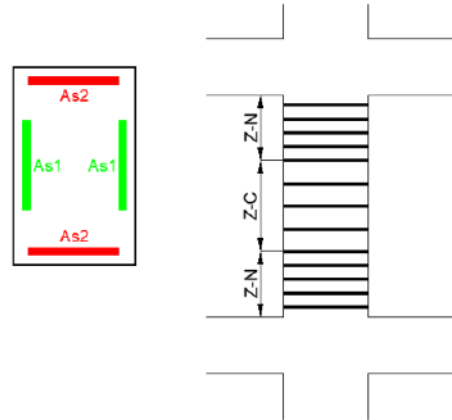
Column cross-section reinforcement layout and longitudinal confinement zones.
